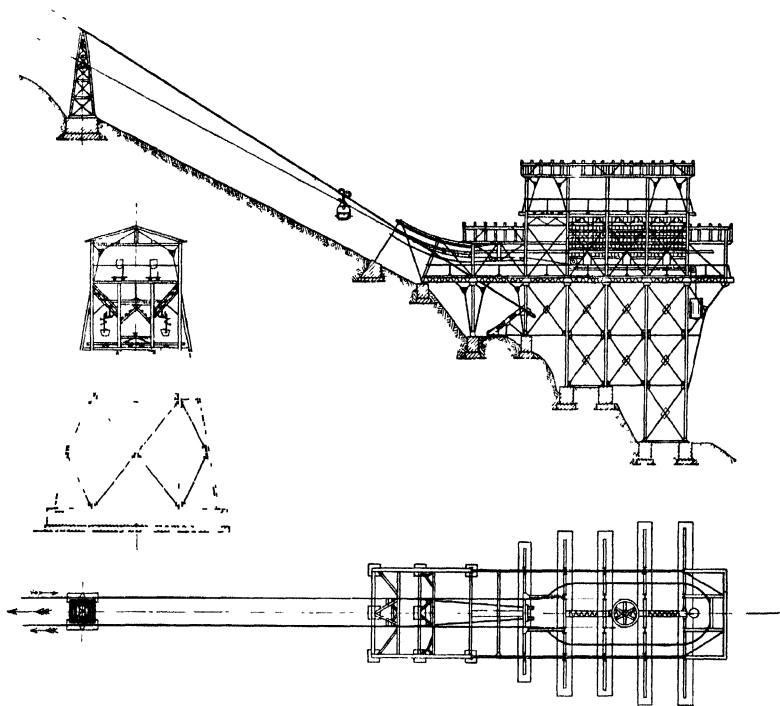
CHARGING-STATION, ELEVATION AND PLAN.
